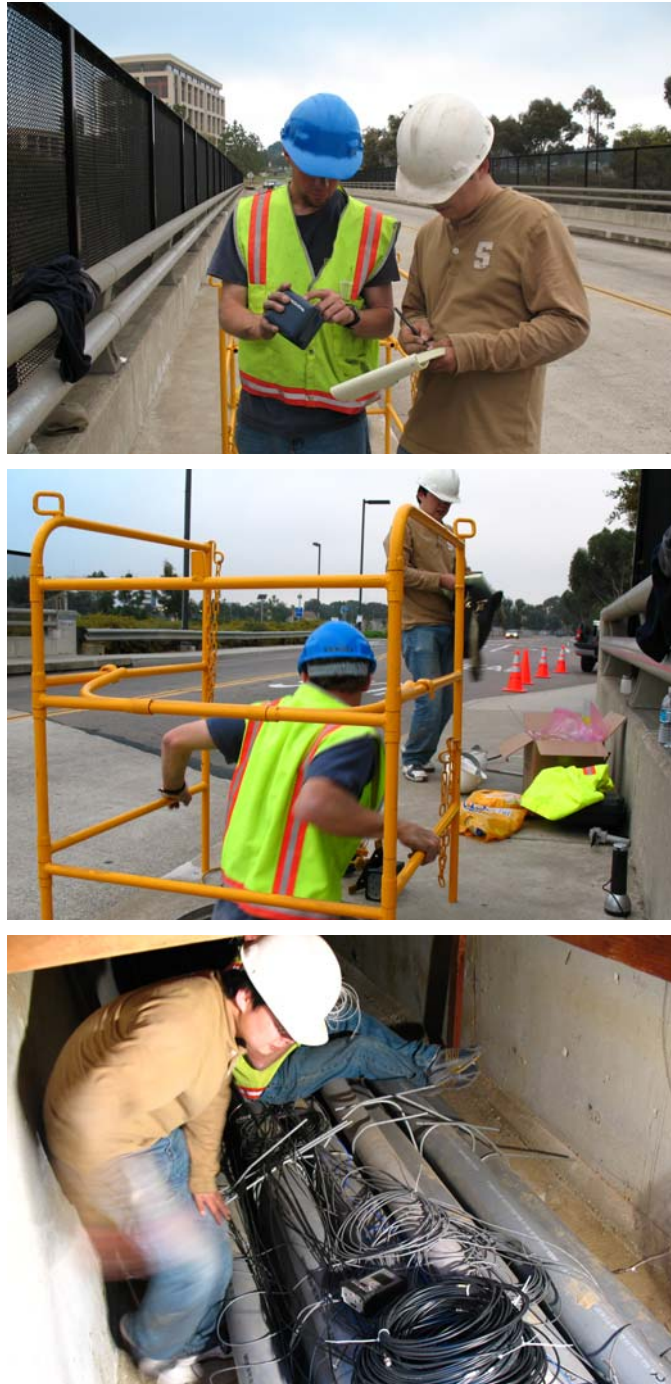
Access to the interior of the bridge box-girder through a manhole
